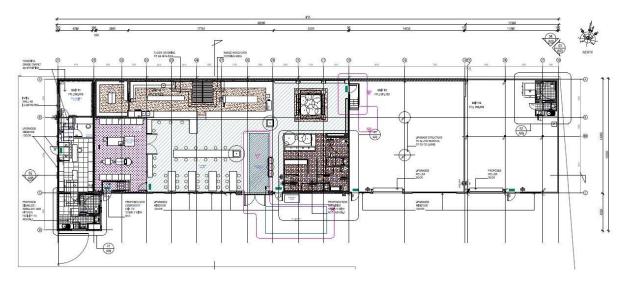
Proposed Floor Plan (Source: Ace Simonovski Design Studio)
